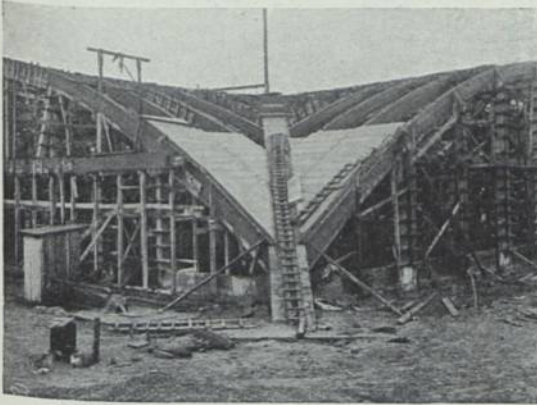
Shed for airships; exterior walls and roof slabs with 2 m. span of reinforced Cell Concrete
